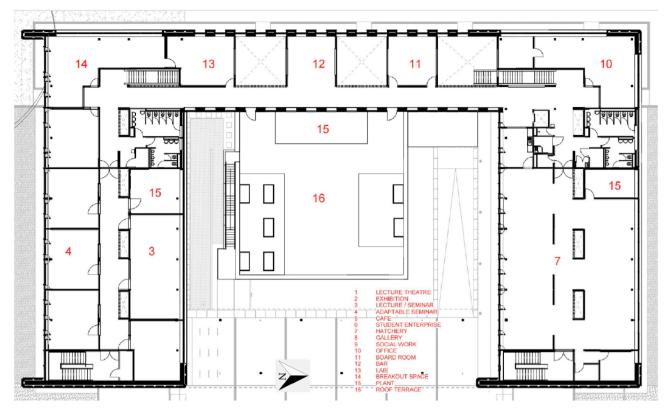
First-floor plan of The Enterprise Centre by Architype [31].
